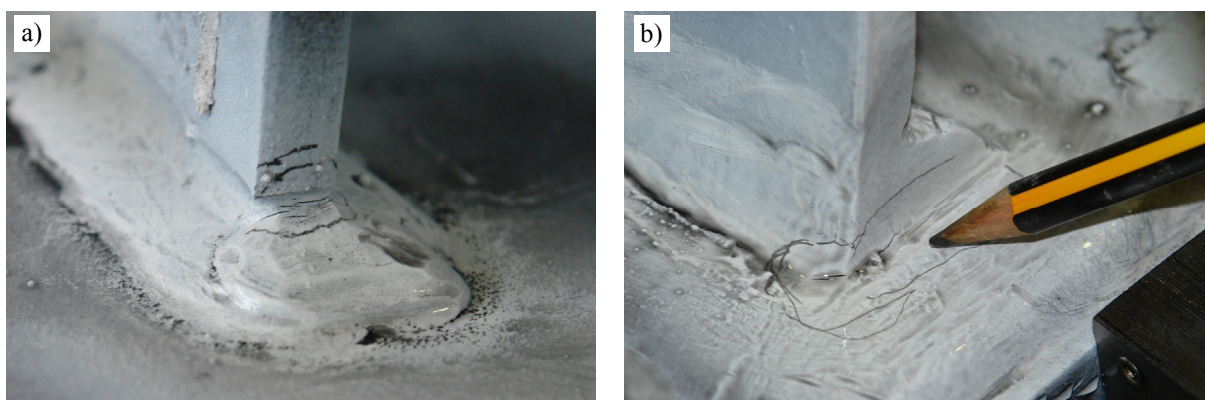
Cracks at the edge of welded connection between the beam flange and the column flange a) specimen RS1.4, b) specimen CP1.3
